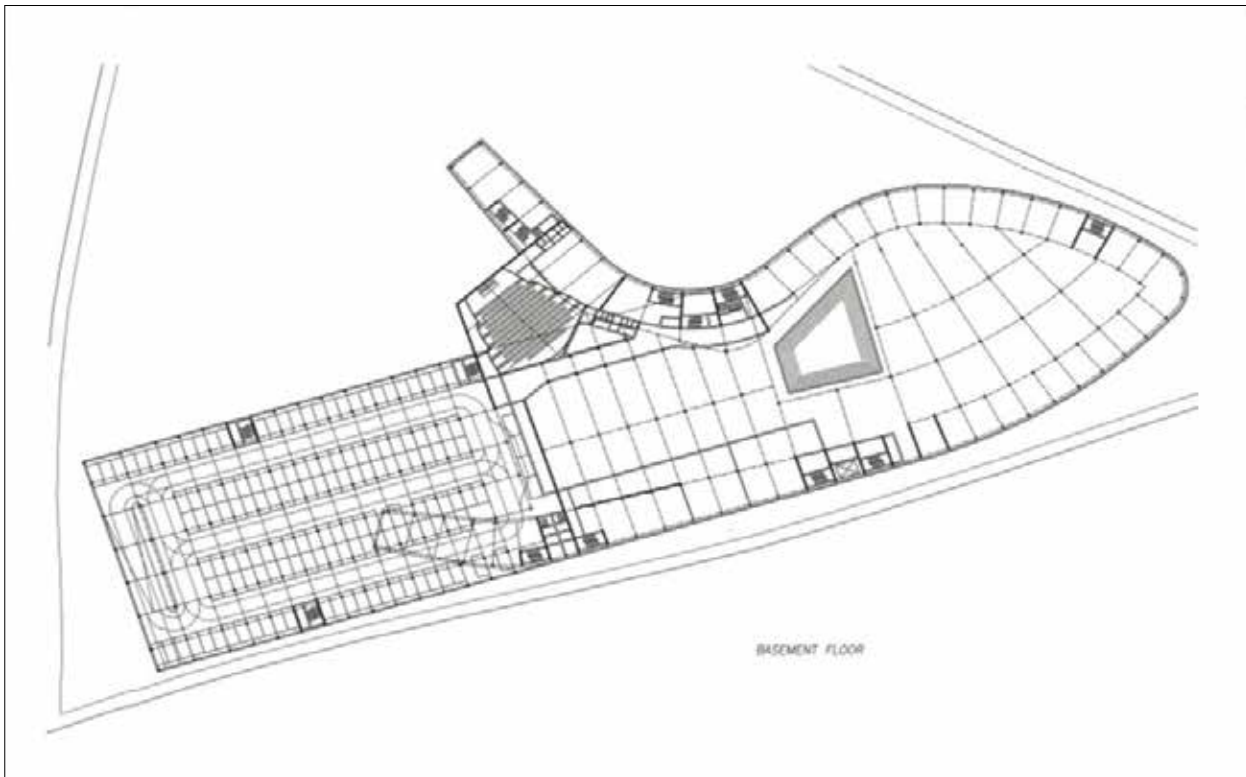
Basement Floor design during the first stage of the architectural competition.
